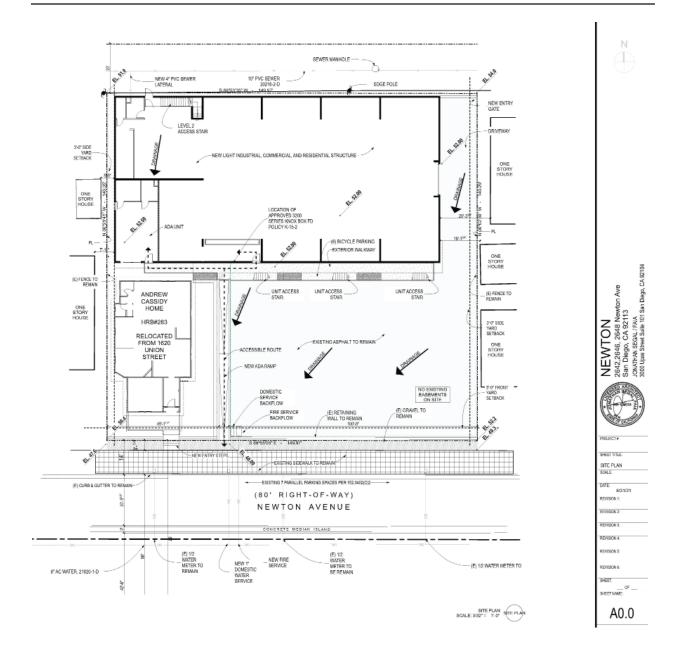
Newton Avenue Proposed Site Plan and future development. Source: Matthew Segal.
